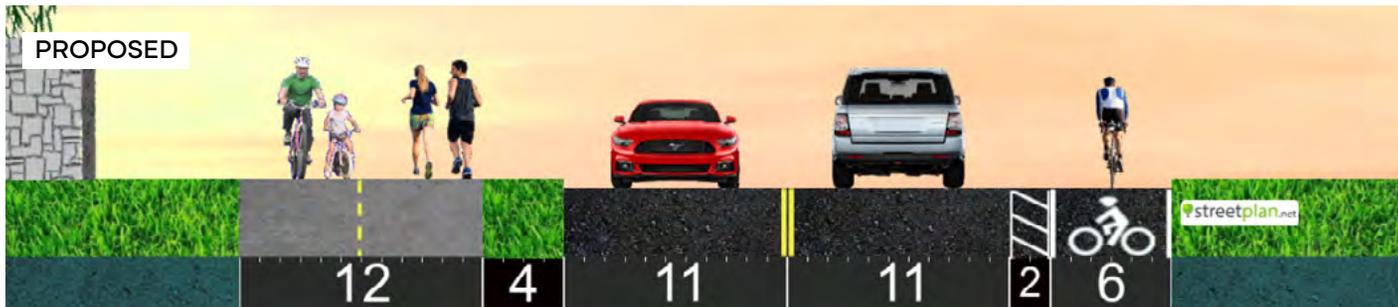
Concept: PVR at Sea Wind Way/Montana Way Mid-Block, looking east
